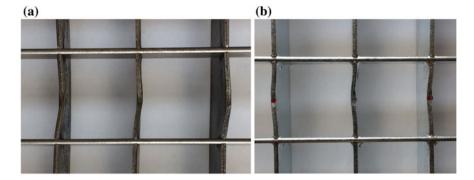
A view of the buckled bearing bars: a grating (S), b grating (Z)
